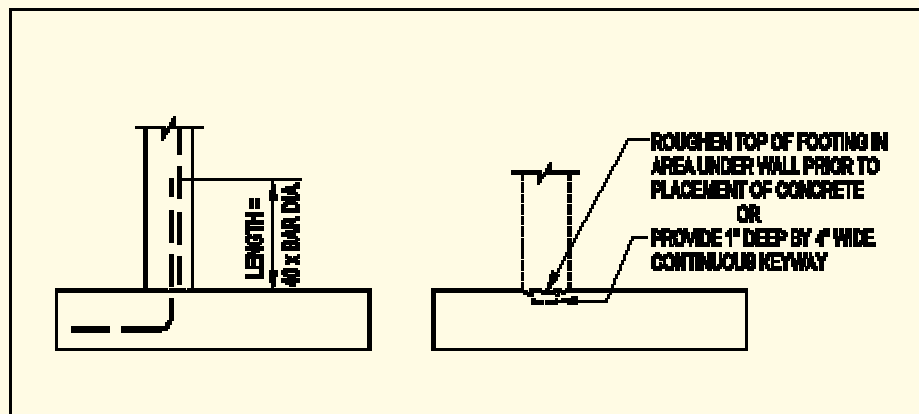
TYPICAL DOWEL AND KEYWAY DETAIL
